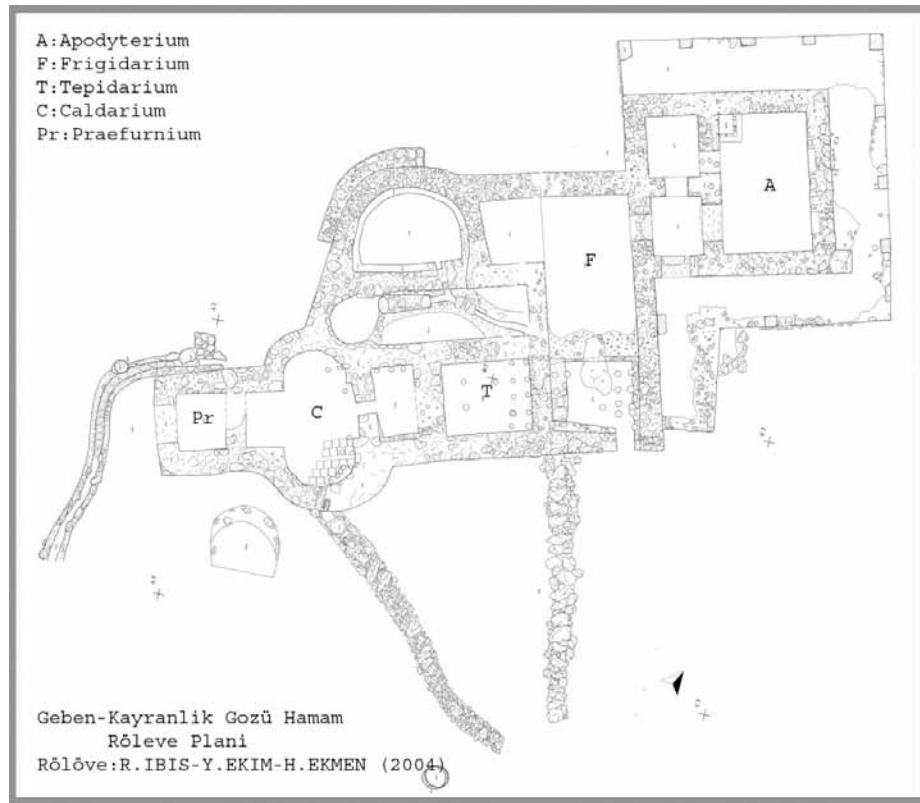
Kayranlık Gözü Bath- Relief Plan.
